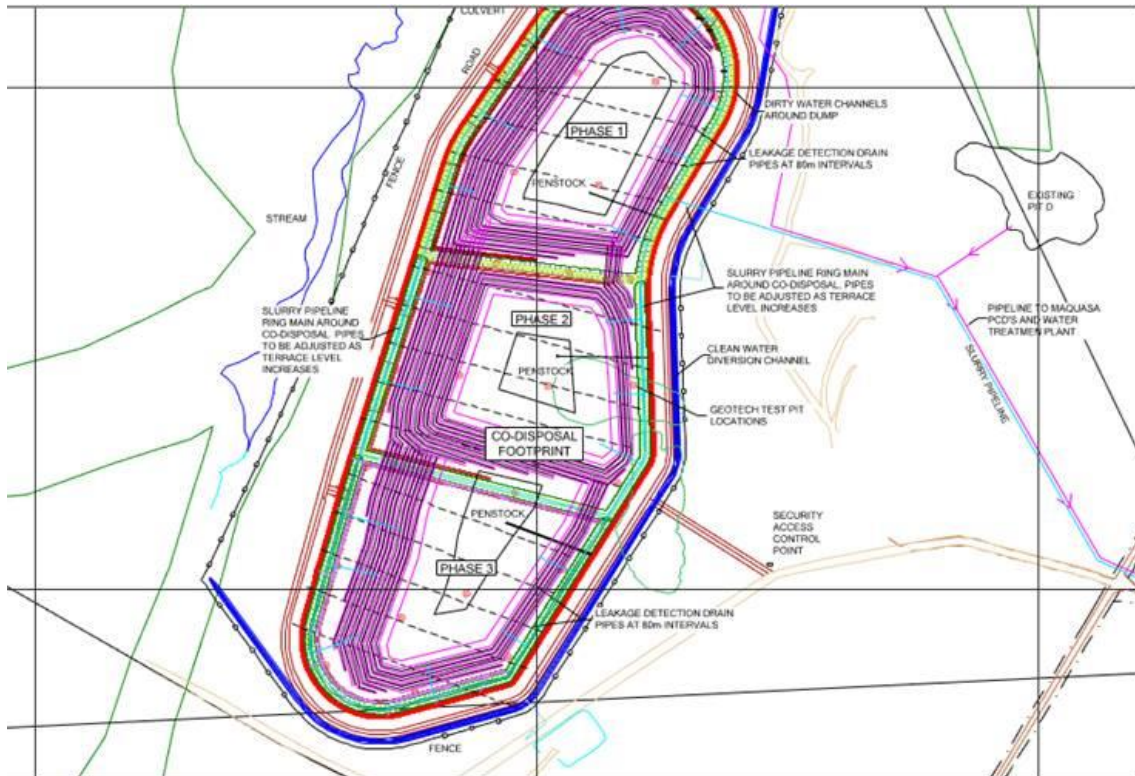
Draft layout of co-disposal (GFK, 2022)
